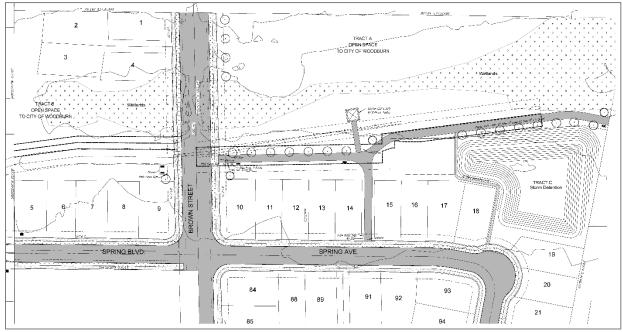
(excerpt of site plan Sheet 4/6 submitted May 27, 2022)
